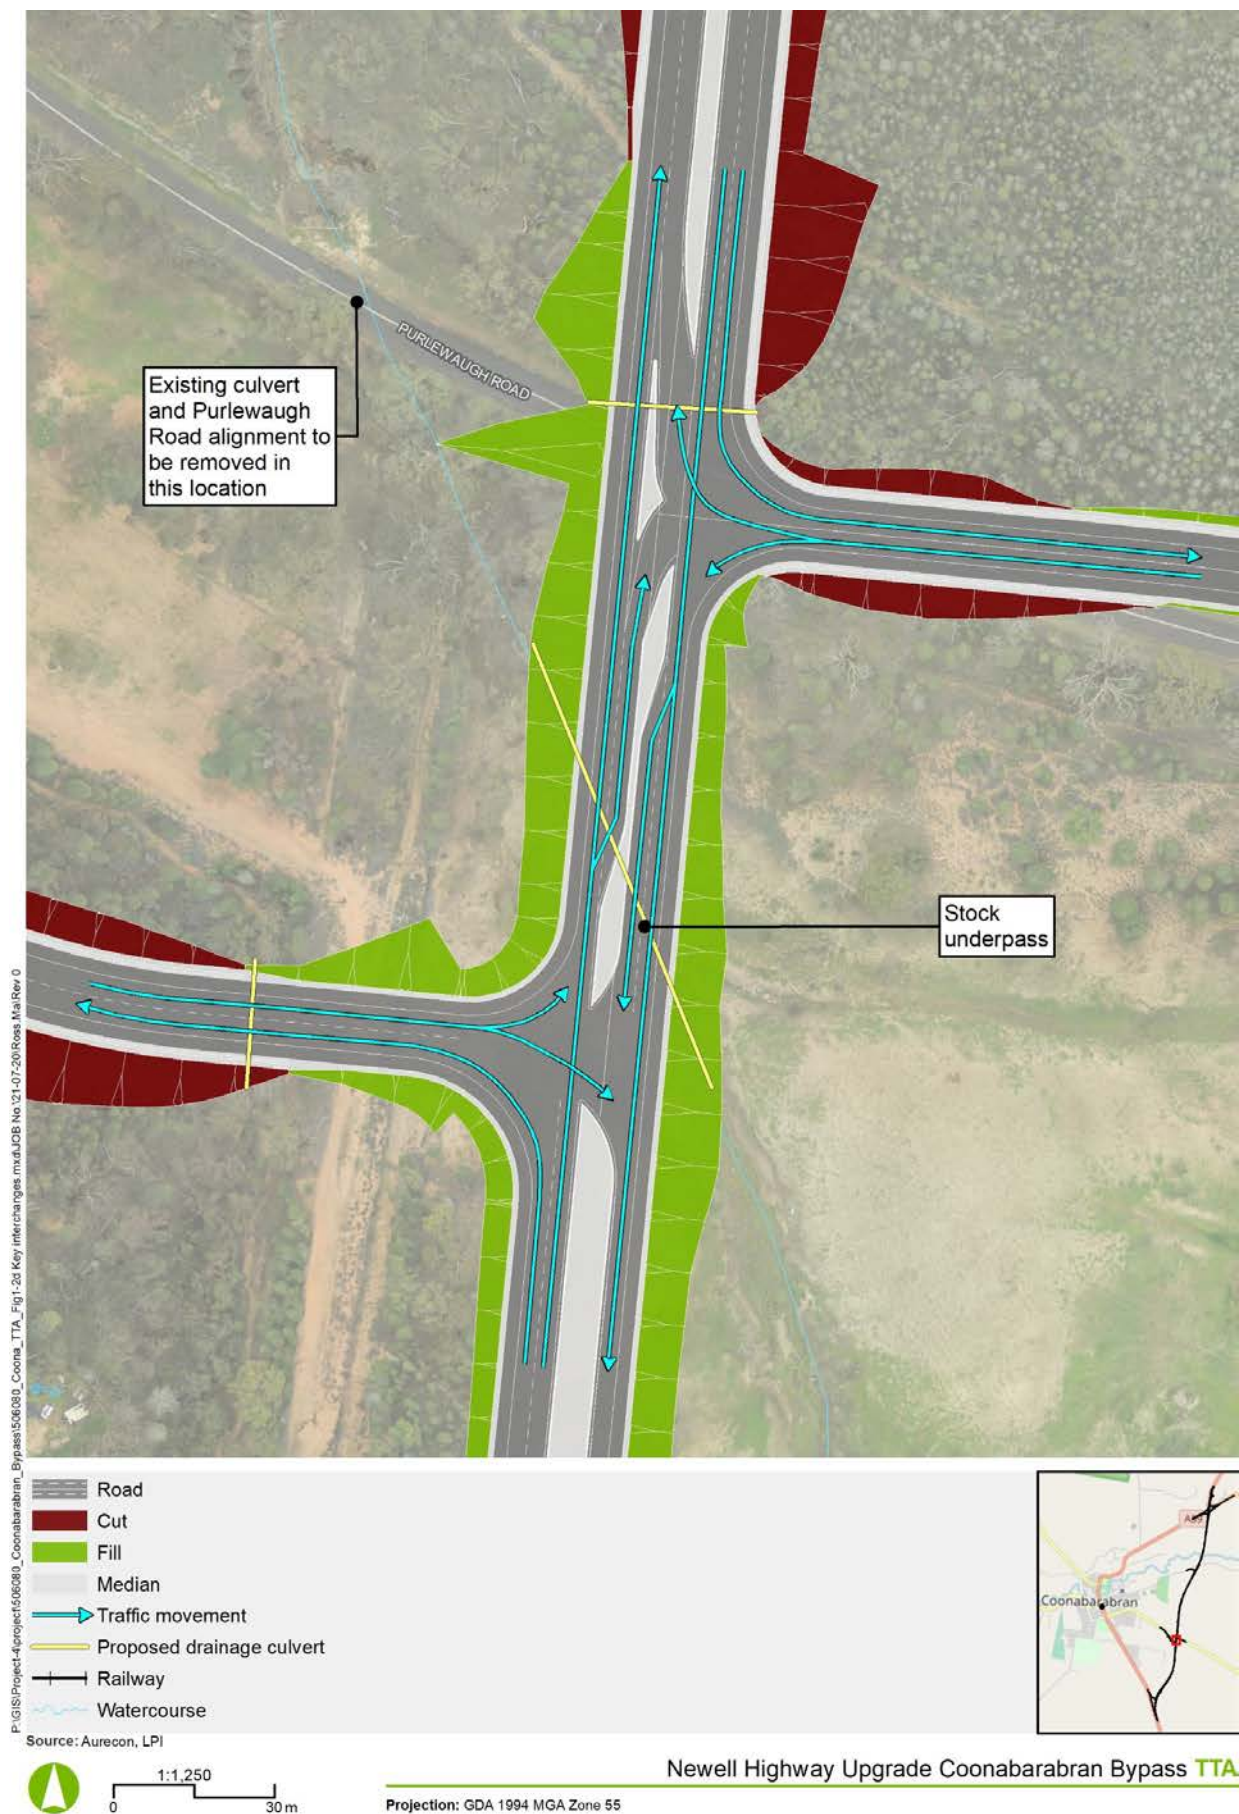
Newell Highway / Purlewaugh Road intersection
